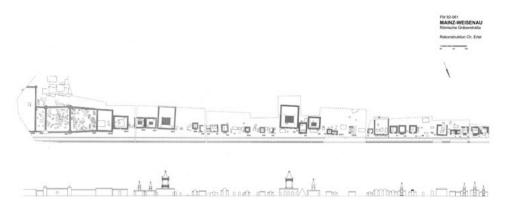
Floorplan and conjectural elevation of the necropolis in Mainz-Weisenau.
